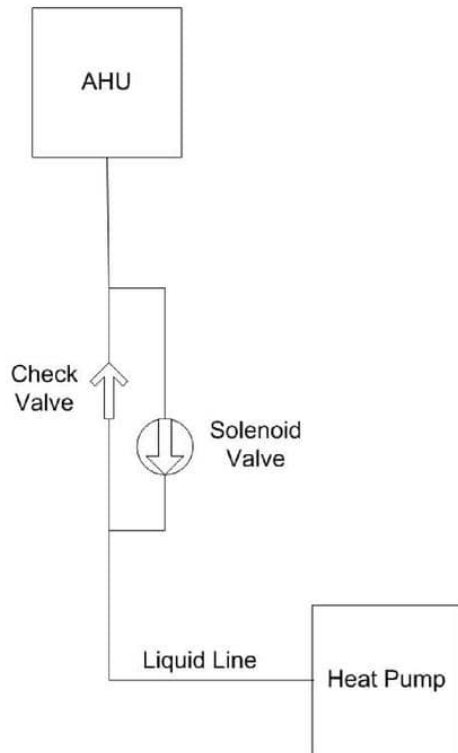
Heat Pump Solenoid/Check Valve Installation Arrangement
